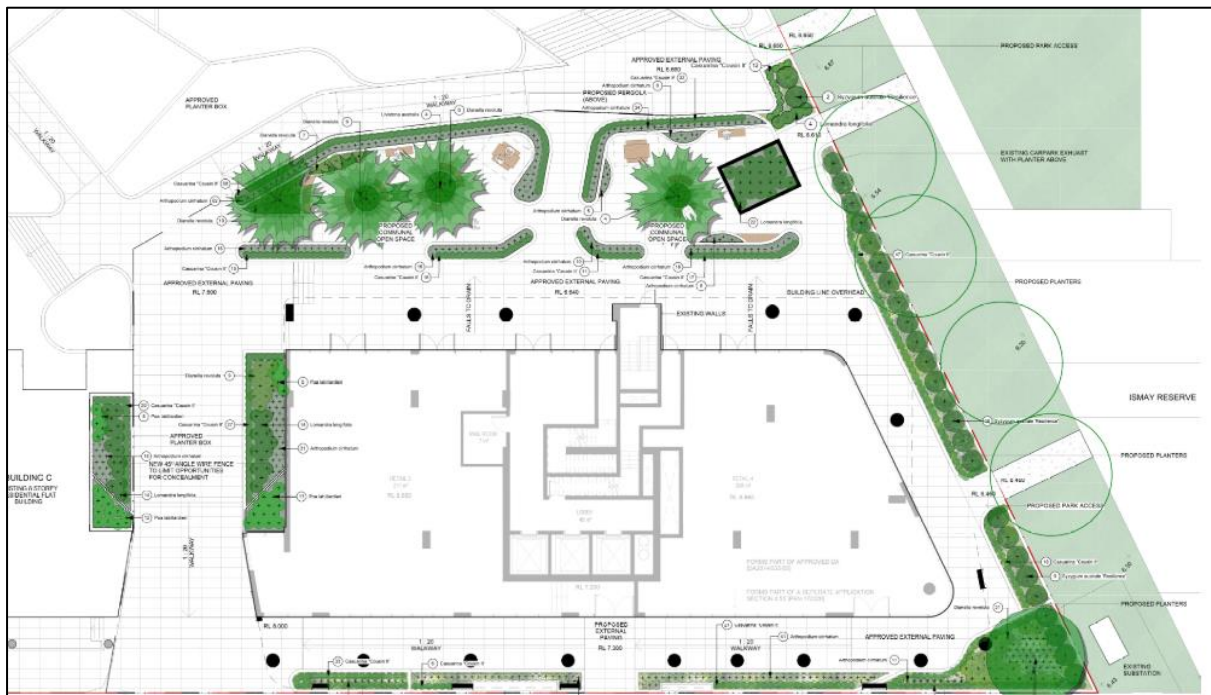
Proposed landscape plan showing embellishment of Communal Open Space areas
